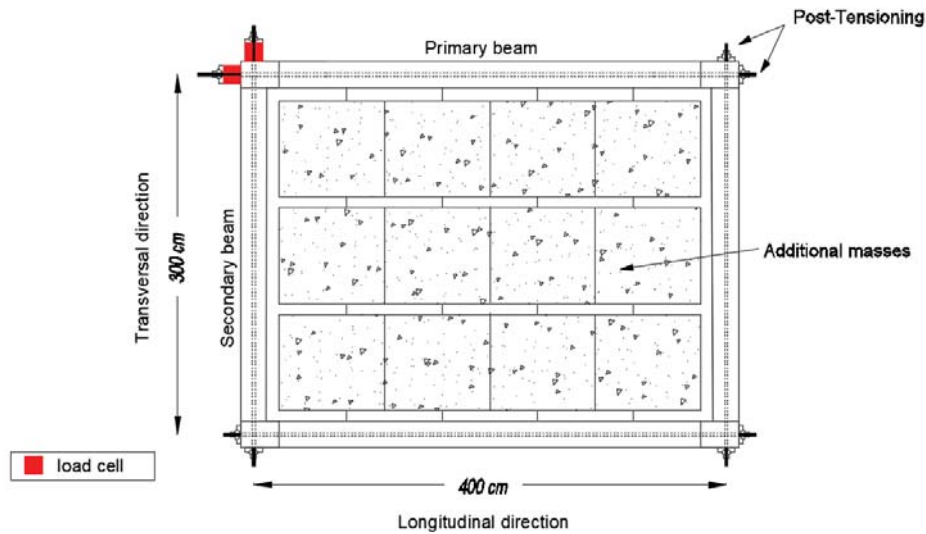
Plan view of timber frame with location of post-tensioned bars.
